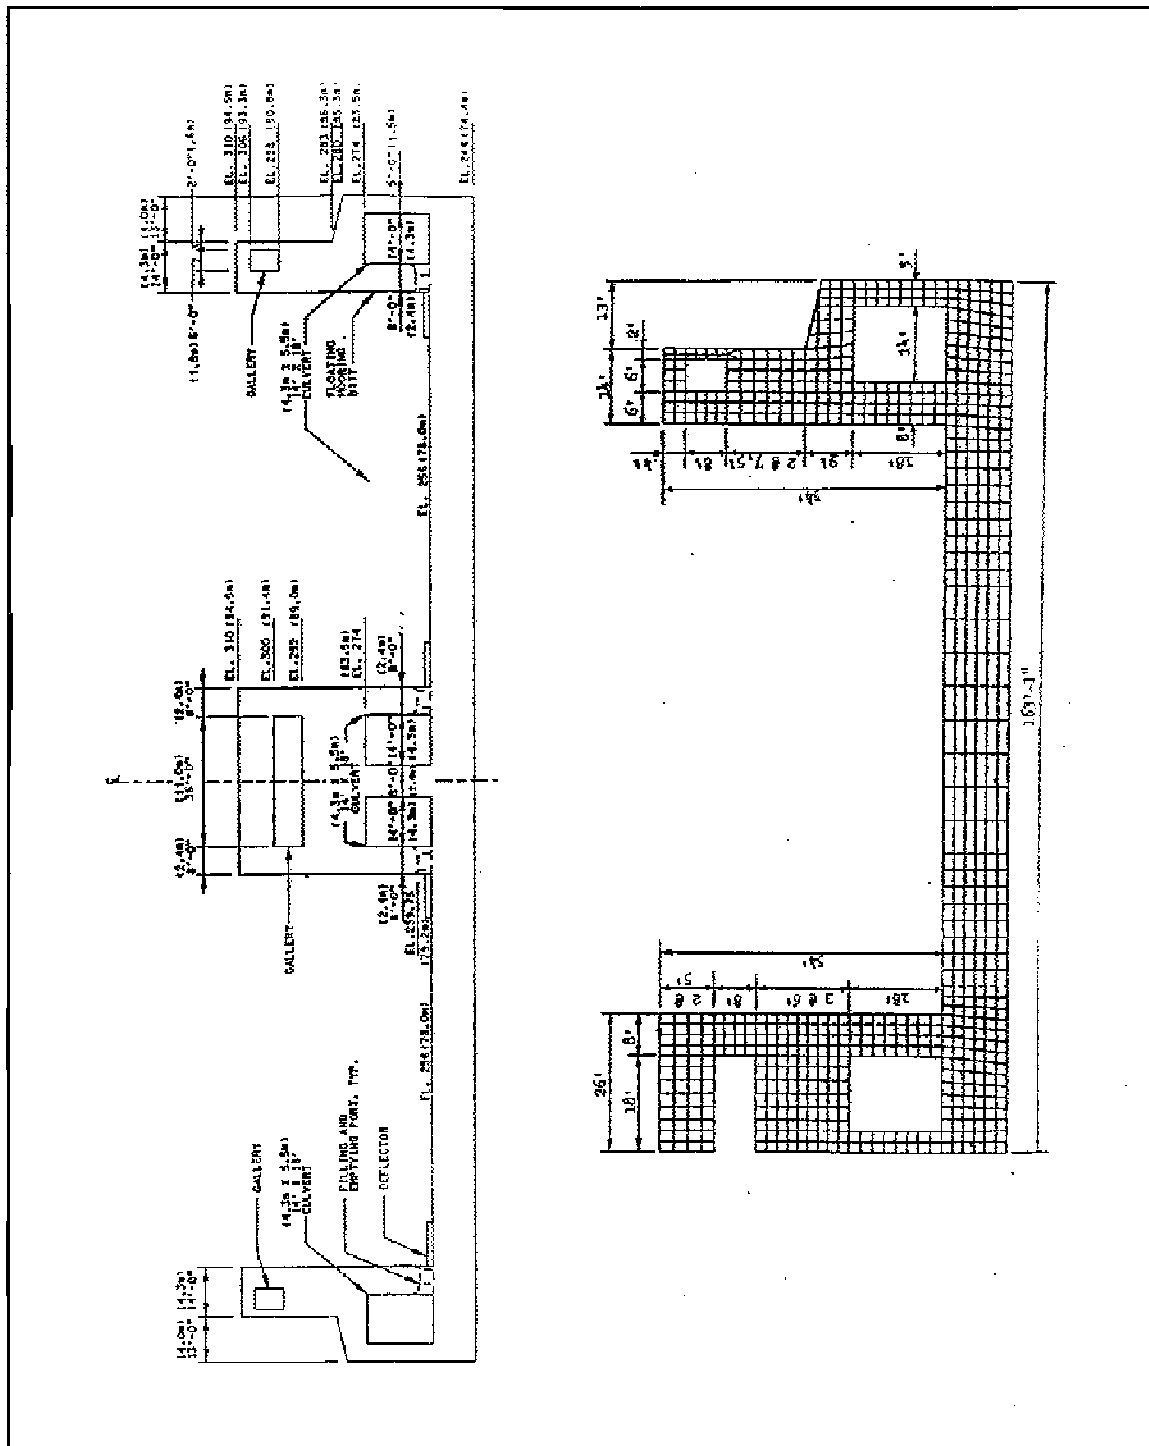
Sectional elevation of a typical chamber monolith at Olmsted Locks and the NISA finite element mesh
